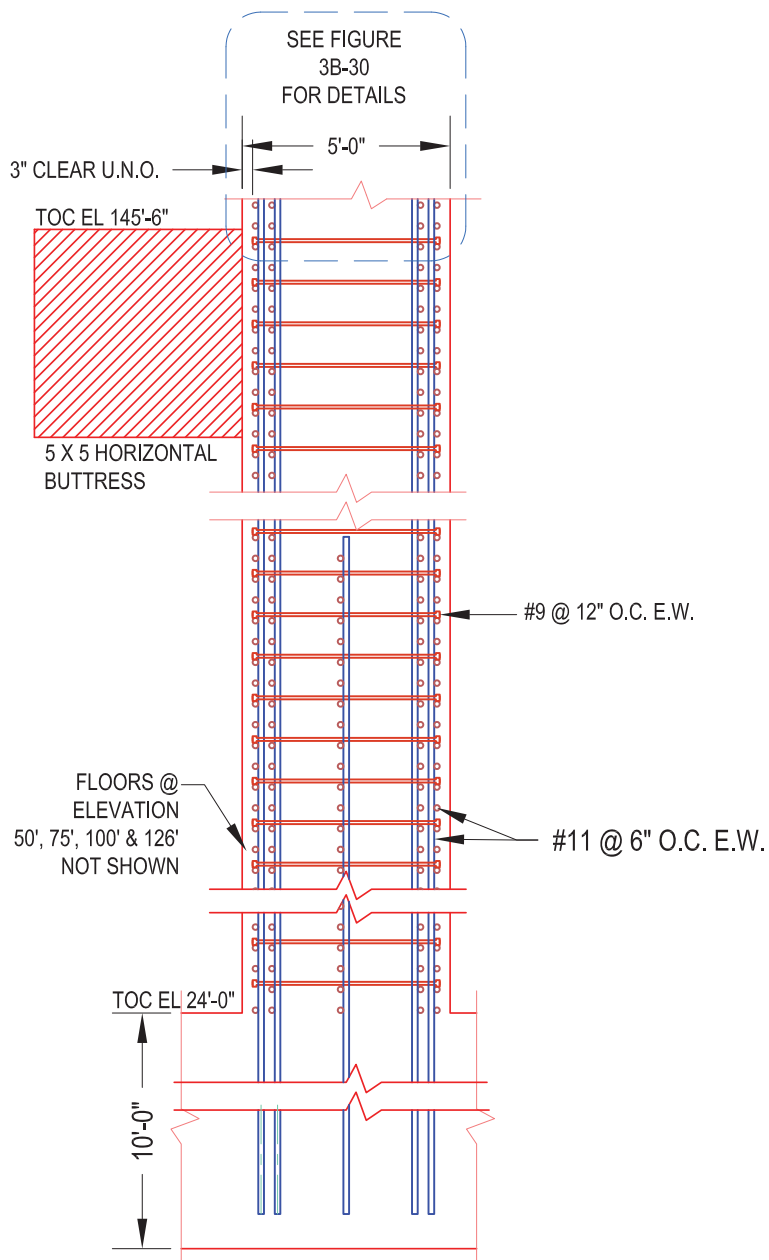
B-23: RXB Reinforcement Elevation at Grid Line E Wall
